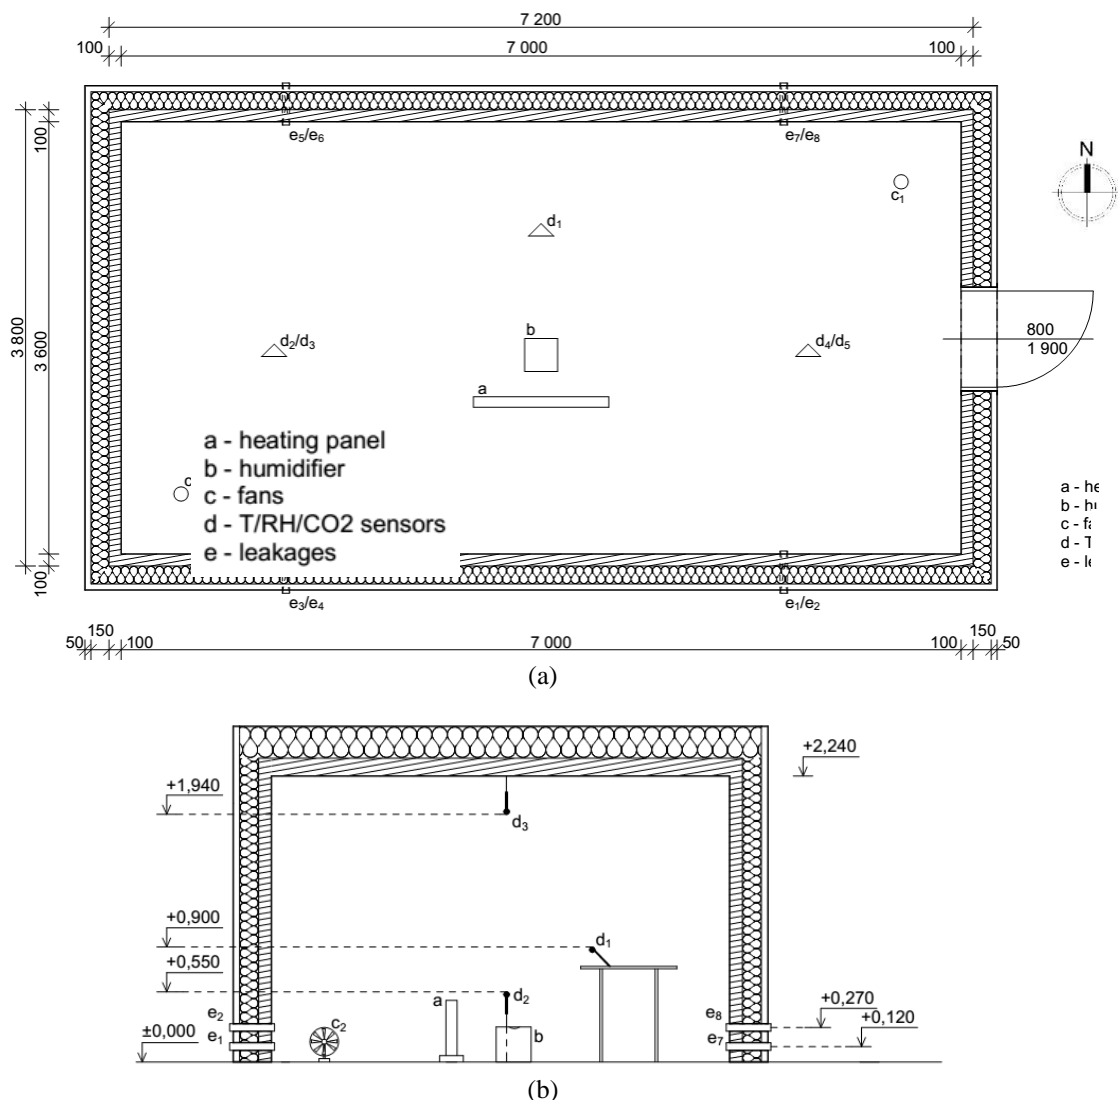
(a) Plan view and (b) cross section of the test house, where schematic representation and positions of the instruments used are shown.
